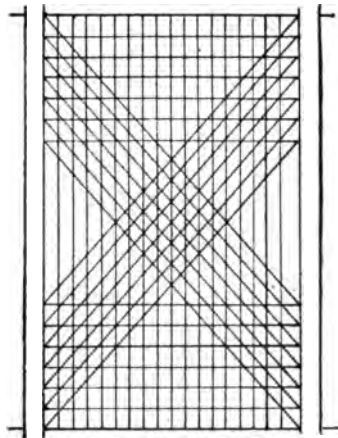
Slab with Suspended Wire Mesh Reinforcement.
